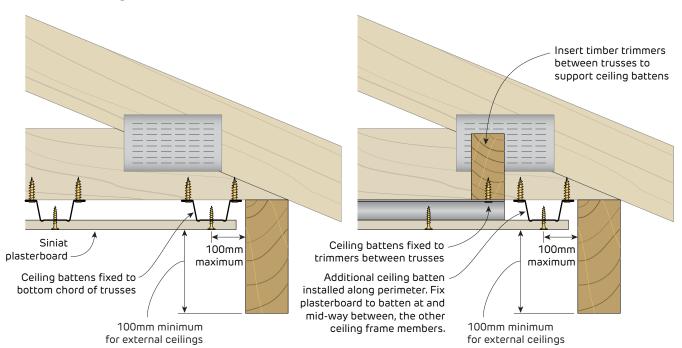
Plasterboard Ceiling Fixed to Battens Ceiling battens installed perpendicular to trusses Section
